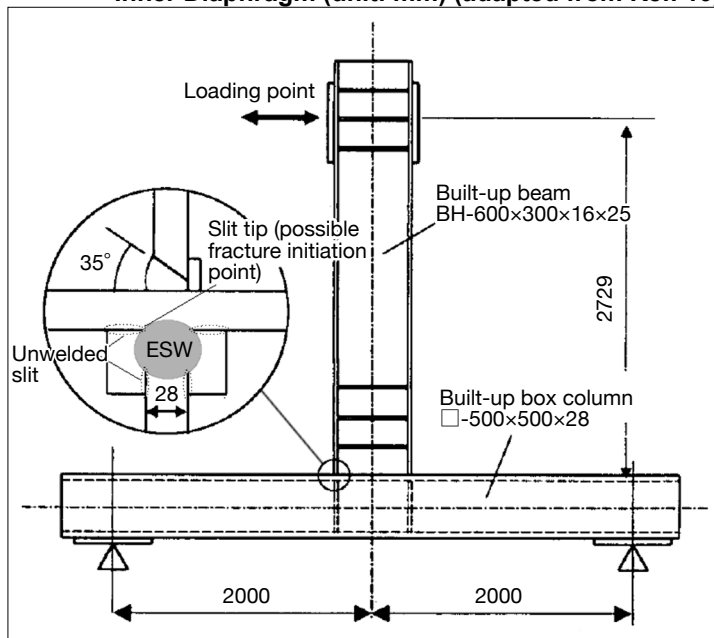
Example of ESW Joint Fracture in Beam-to-Box Column Subassembly Loading Tests (adapted from Ref. 5)
